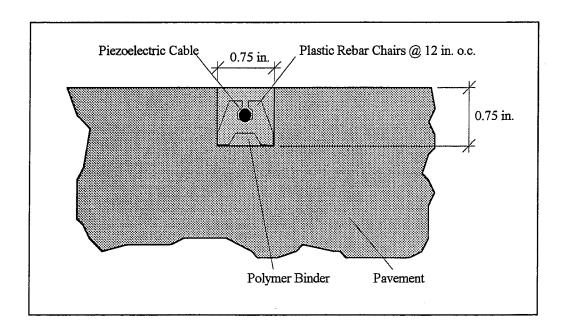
Bare Cable Sensor Installation (1 in. = 25.4 mm)
